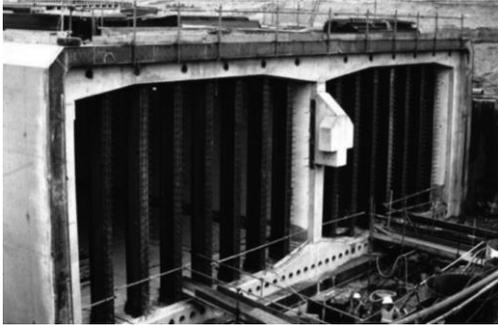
, TUNNEL ELEMENT FACE INCLUDING NOSE (BABER & LUNISS, 2013)
